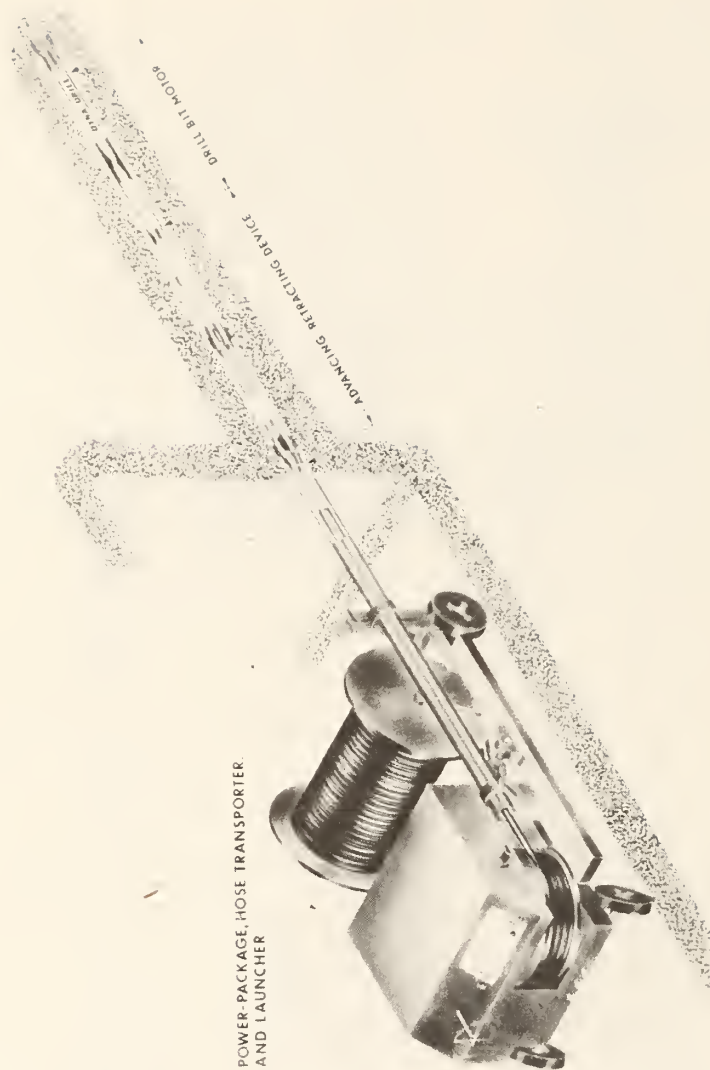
PROPOSED DOWNHOLE EQUIPMENT
